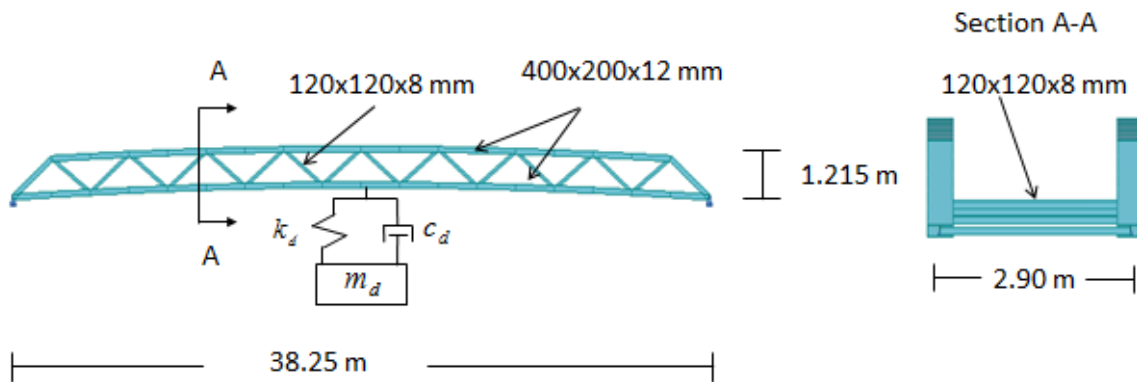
Elevation of the considered footbridge [3] and location of the TMD.
